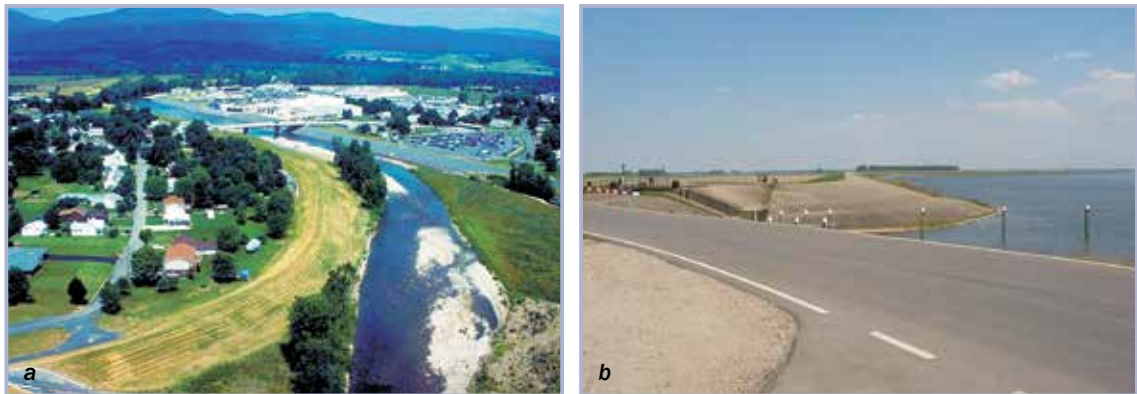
Typical riverine levee (a) (courtesy USACE) and typical coastal levee (b) (courtesy STOWA)
